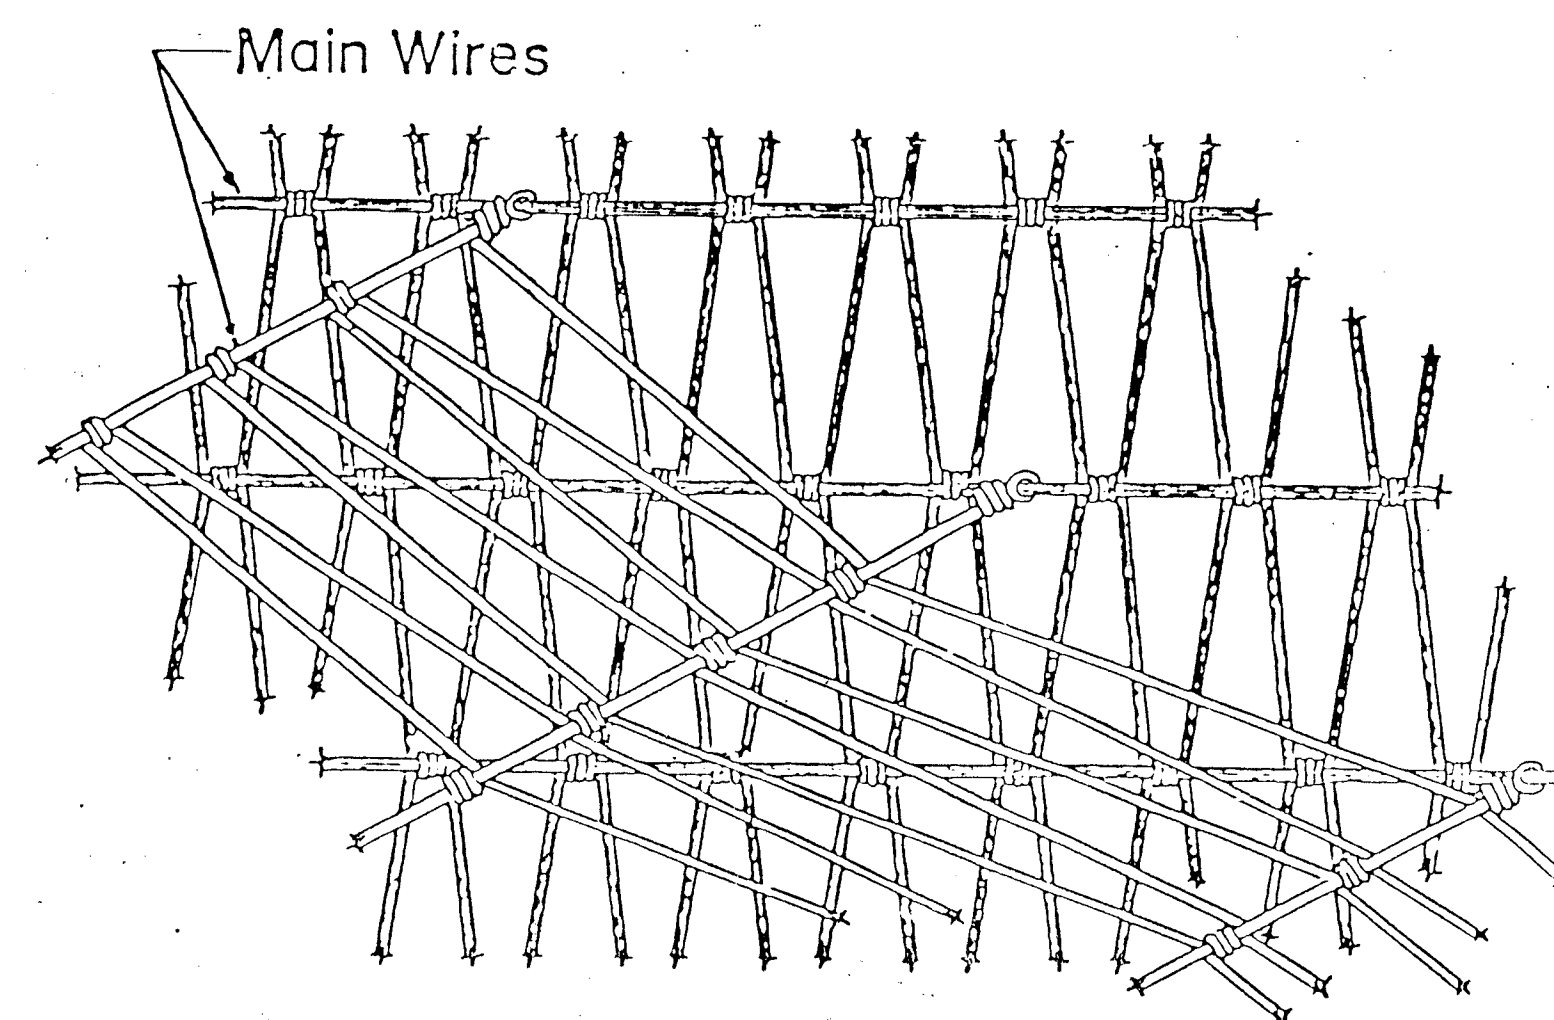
DETAIL OF WIRE FABRIC AND NORMAL SPLICE
